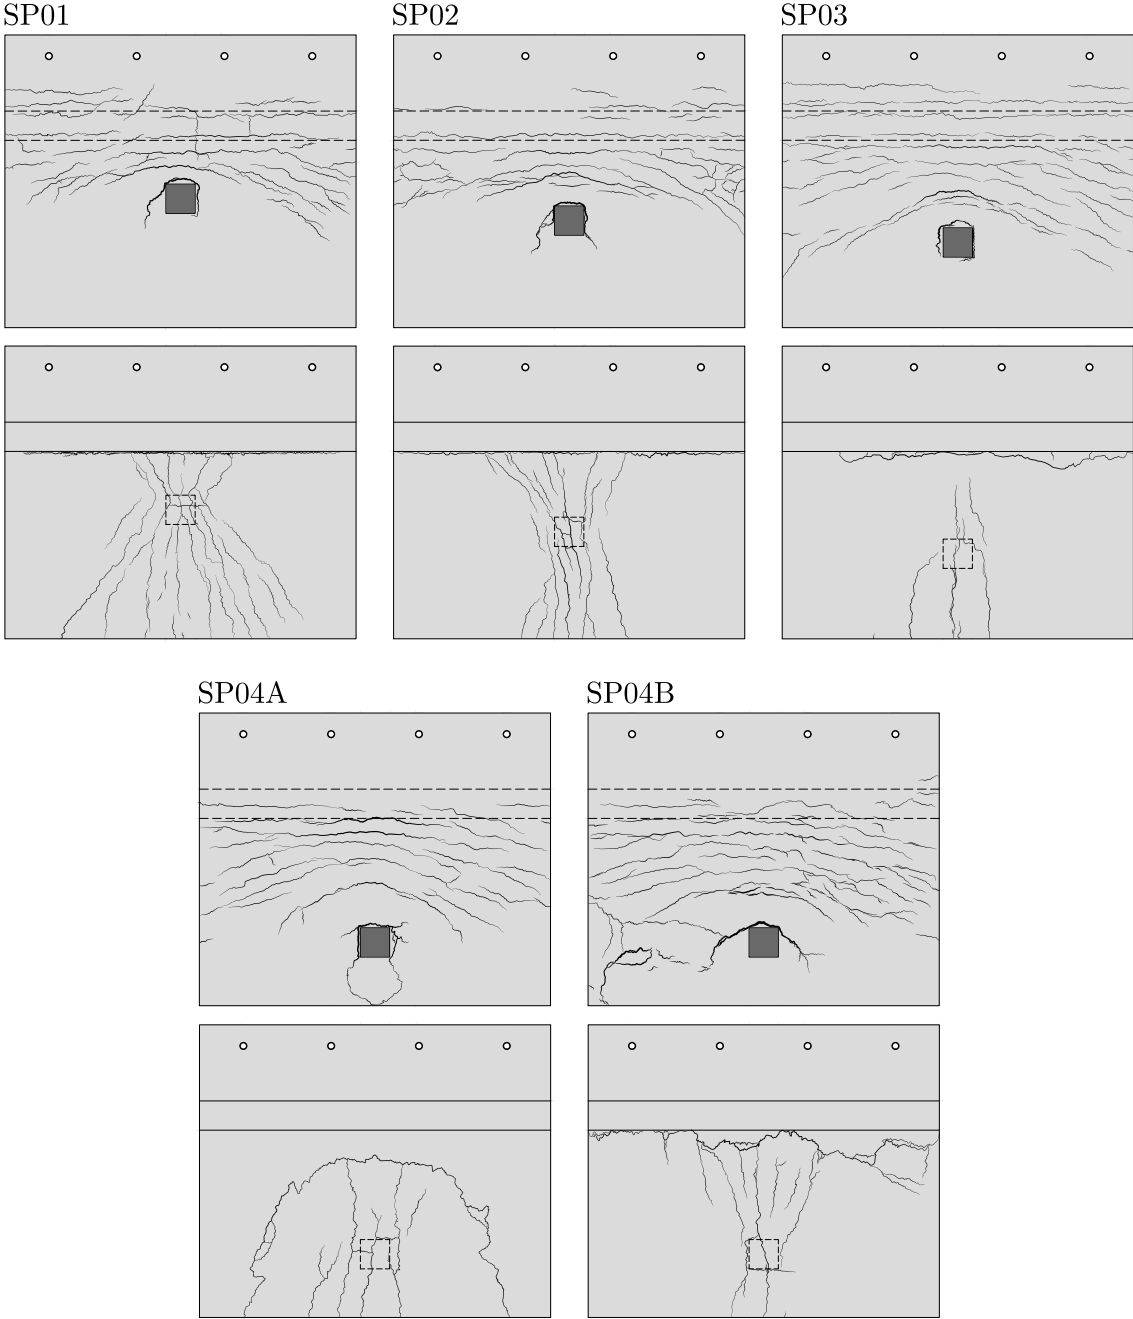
Top and bottom surfaces of cracking patterns after failure.
